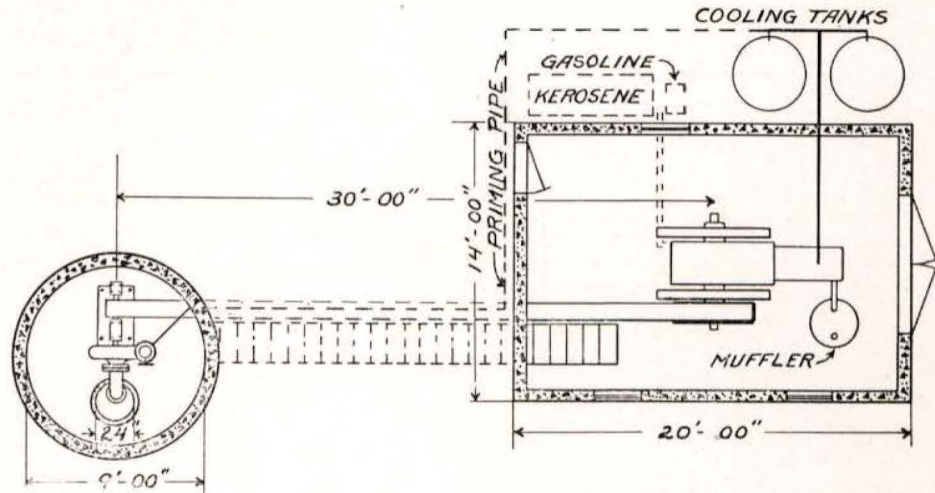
Plan of pumping plant as installed at North Platte Substation
